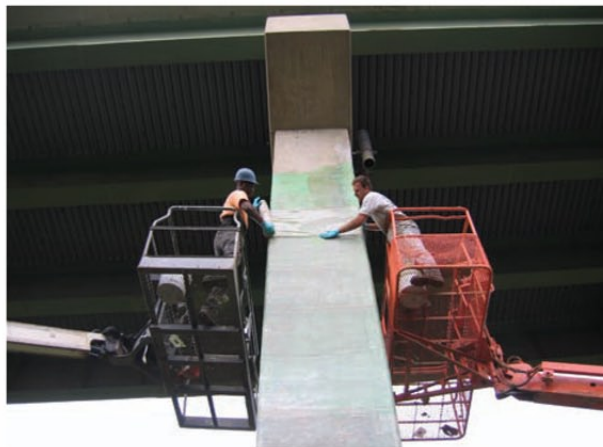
Workers on lifts wrapping the bridge pier with GFRP.
